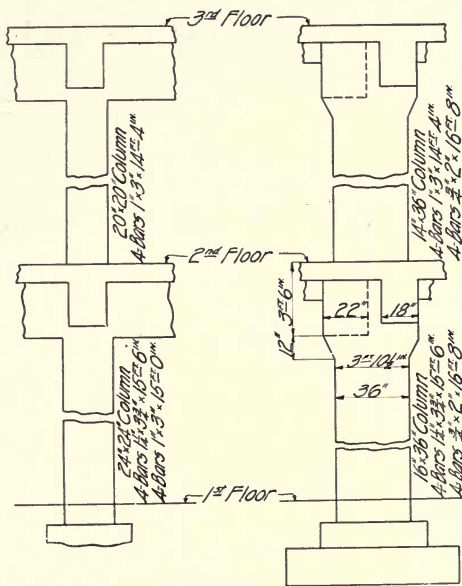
Typical Interior Columns in Packard Factory. (See p. 136.)
